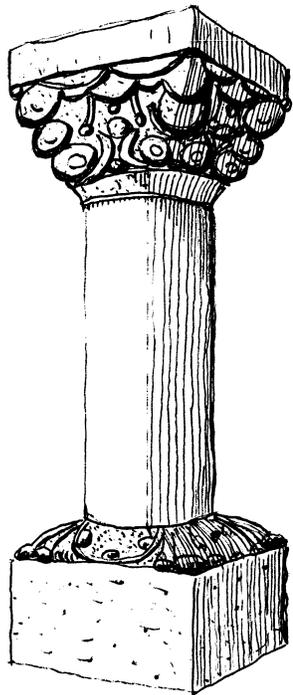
Detail, support column, main entrance, First Congregational Church (13).
